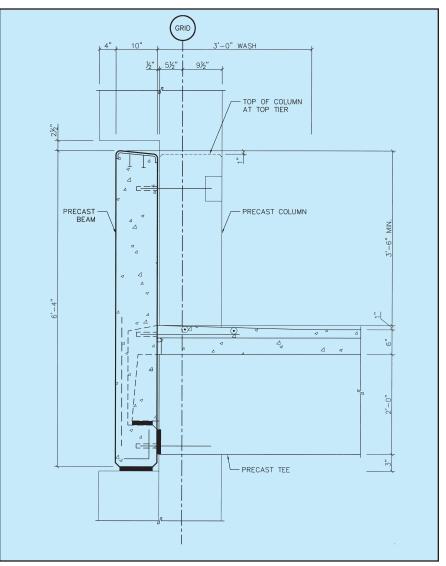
Typical exterior panel, showing where the double-tee frames into the pocketed precast beam.
